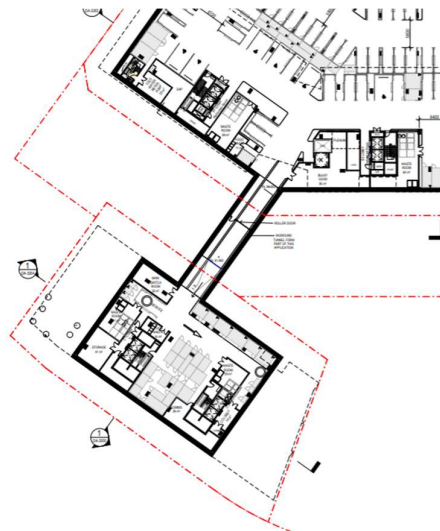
Amended layout of Basement 01 showing rationalised extent of basement underneath Building C with single lane tunnel to basement underneath Buildings A and B
